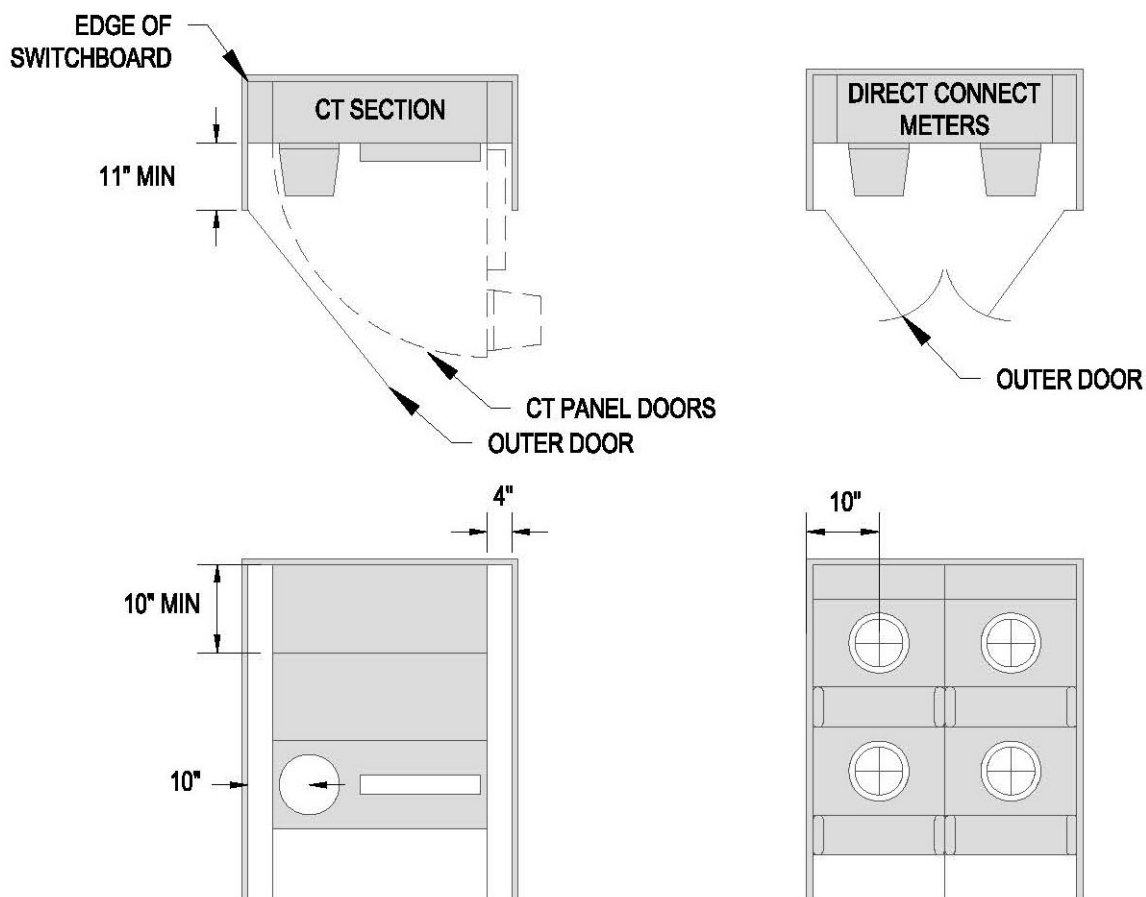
Outdoor Switchboard Metering (EUSERC 354) - (STD-D-6254)
